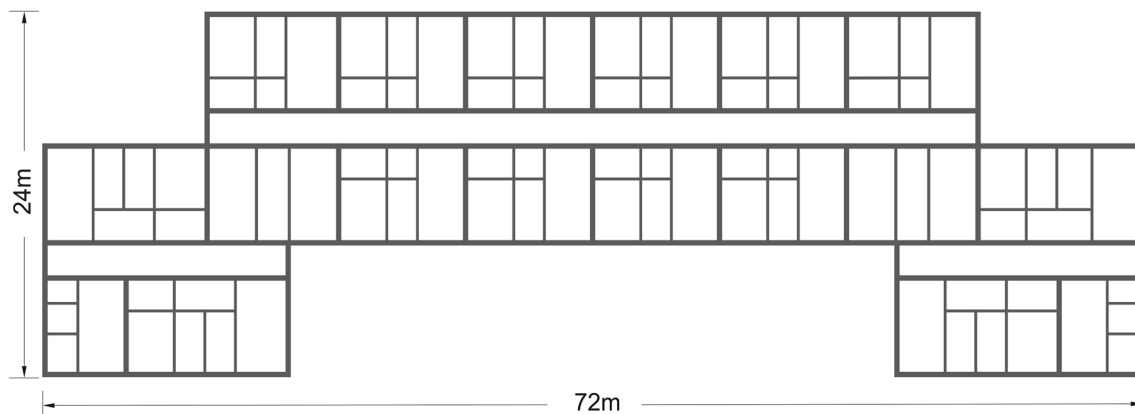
Wall model of the tower block (pictorial plan of storey)
